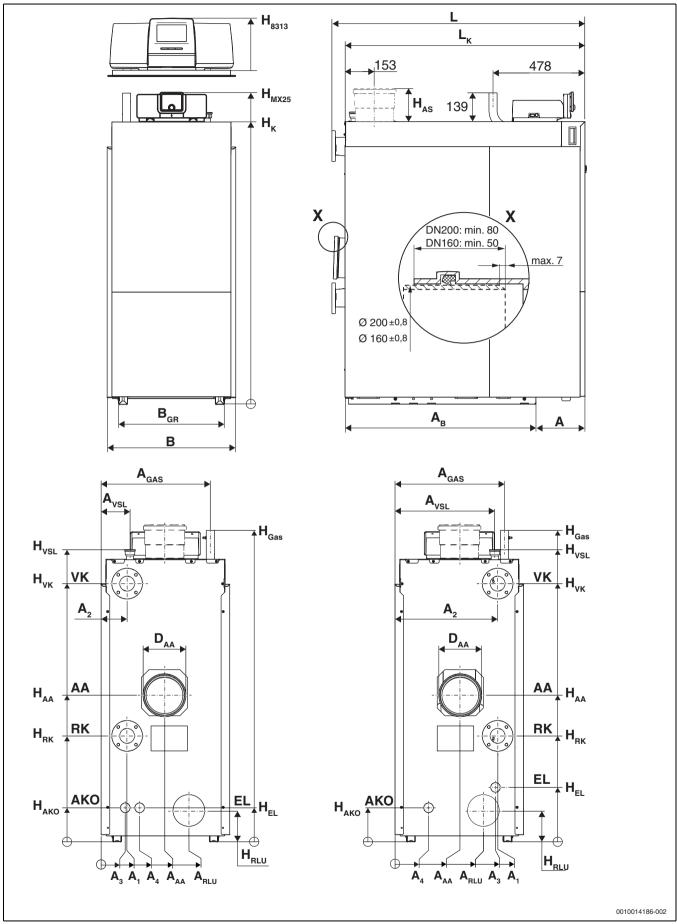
Dimensions and connections for Condens 7000 F, 150...300 kW (right and left-hand version; dimensions in mm)
